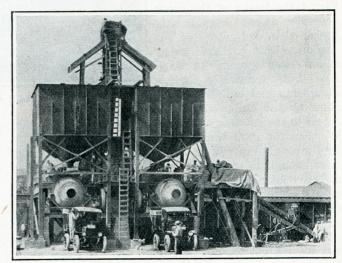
MOTOR TRUCKS TAKING LOAD AT MIXING PLANT
